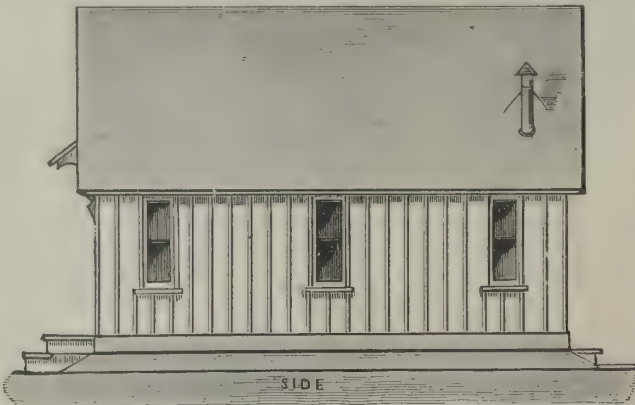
SIDE VIEW OF SUMMER COTTAGE.
